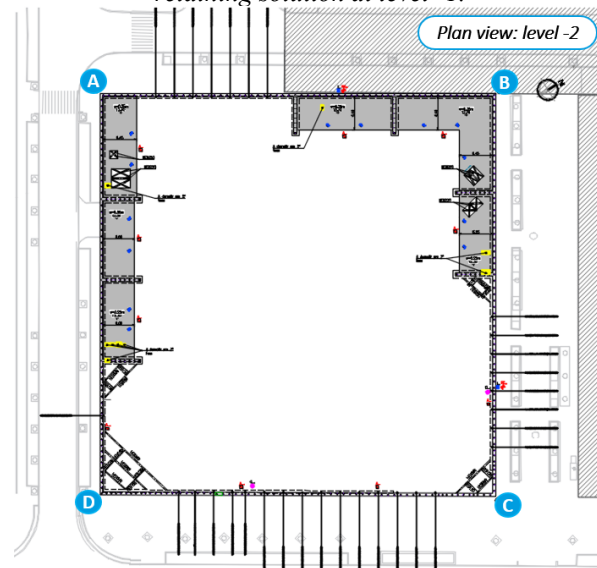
Design plan view of the peripheral earth retaining solution at level -2.
